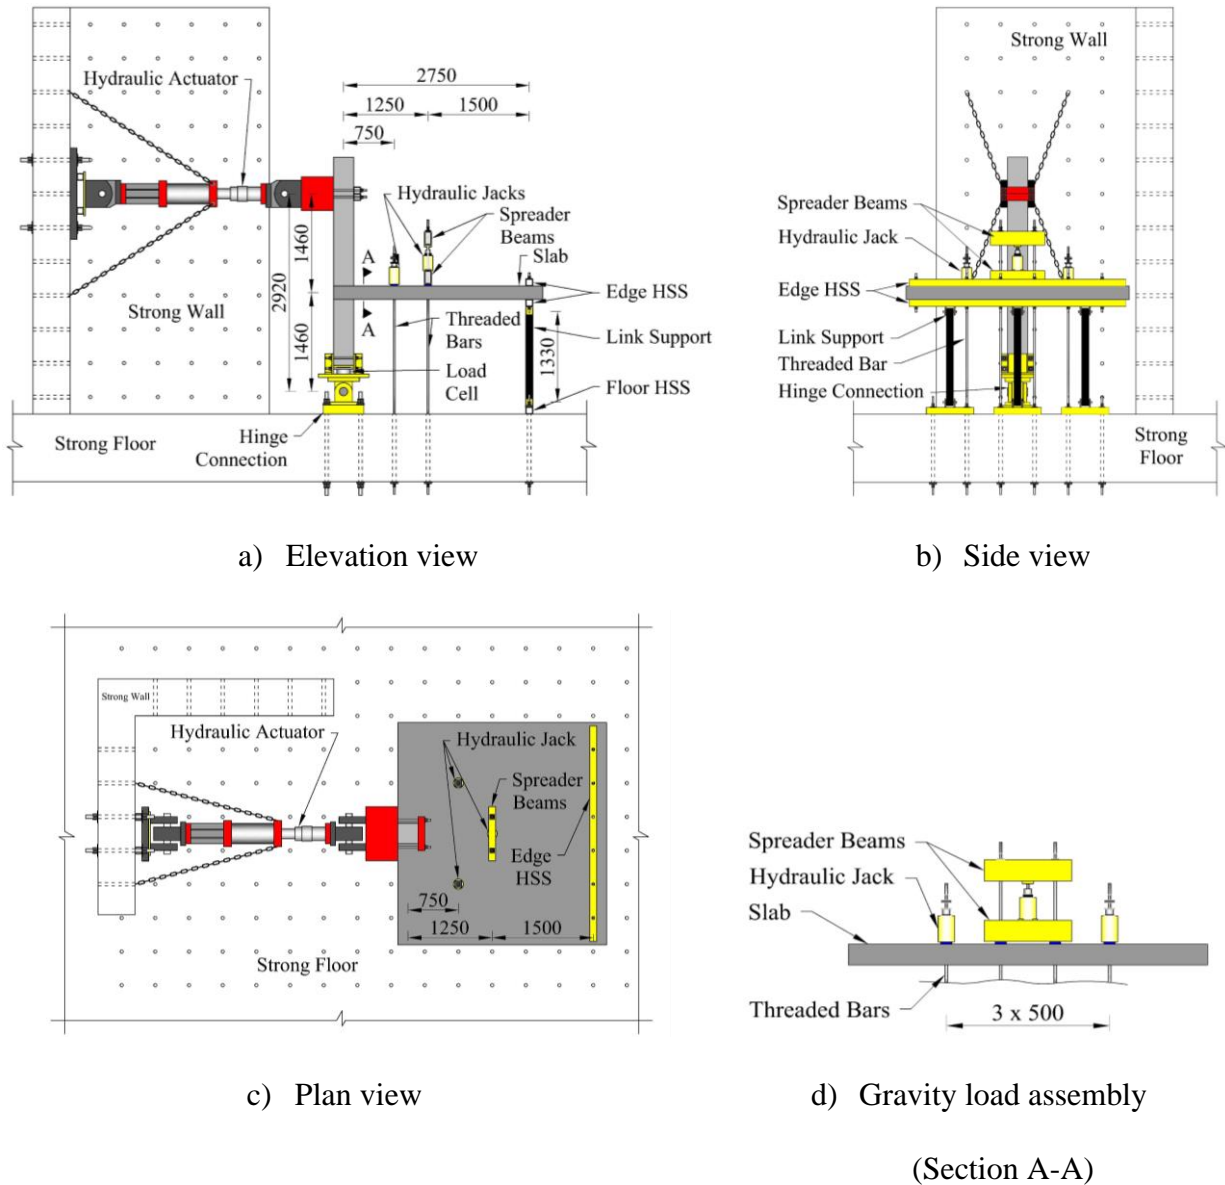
Schematic drawing of the test setup (dimensions in mm)
